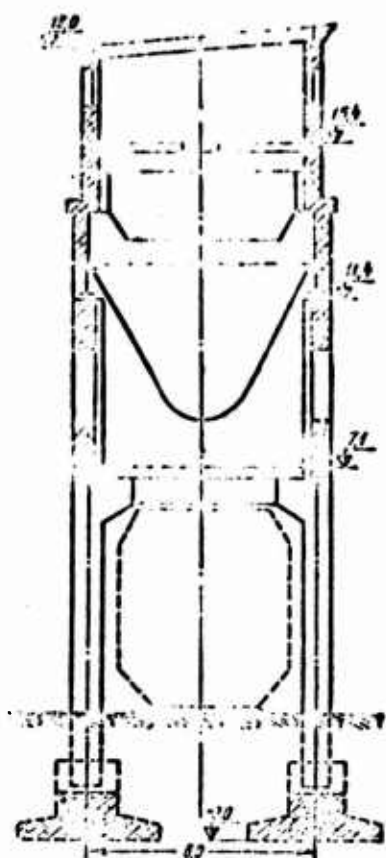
Precast ferro-concrete loading ore hopper with a parabolic capacitive part and with H-shaped frames.
